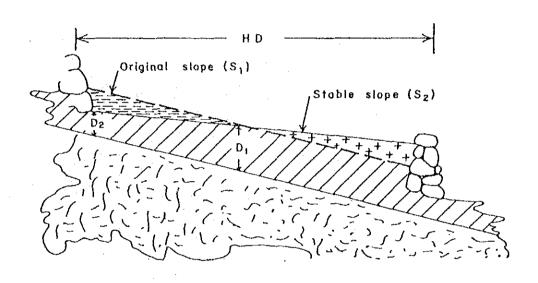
Sketch of Bench Terrace Constructed on the Principle of the Stable Slope
